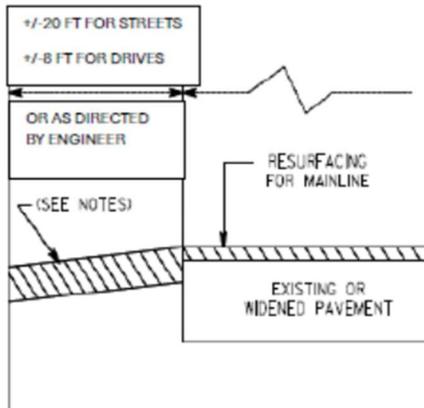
DETAIL FOR PAVING TURNOUTS FOR SIDE ROADS, STREETS, AND DRIVES
